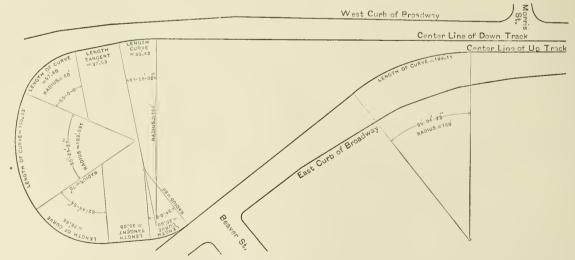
PLAN OF BOWLING GREEN LOOP—BROADWAY CABLE RAILWAY.
